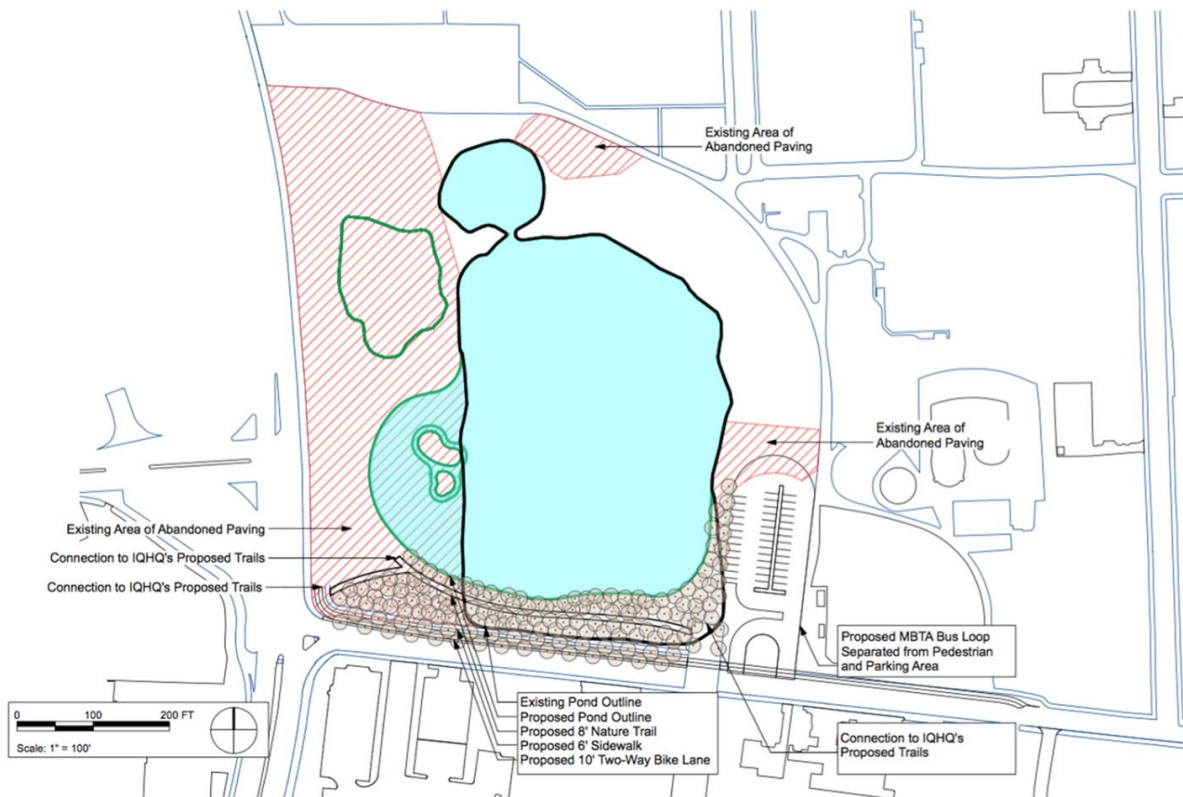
Friends of Jerry's Pond (FoJP) Improvements Plan.
